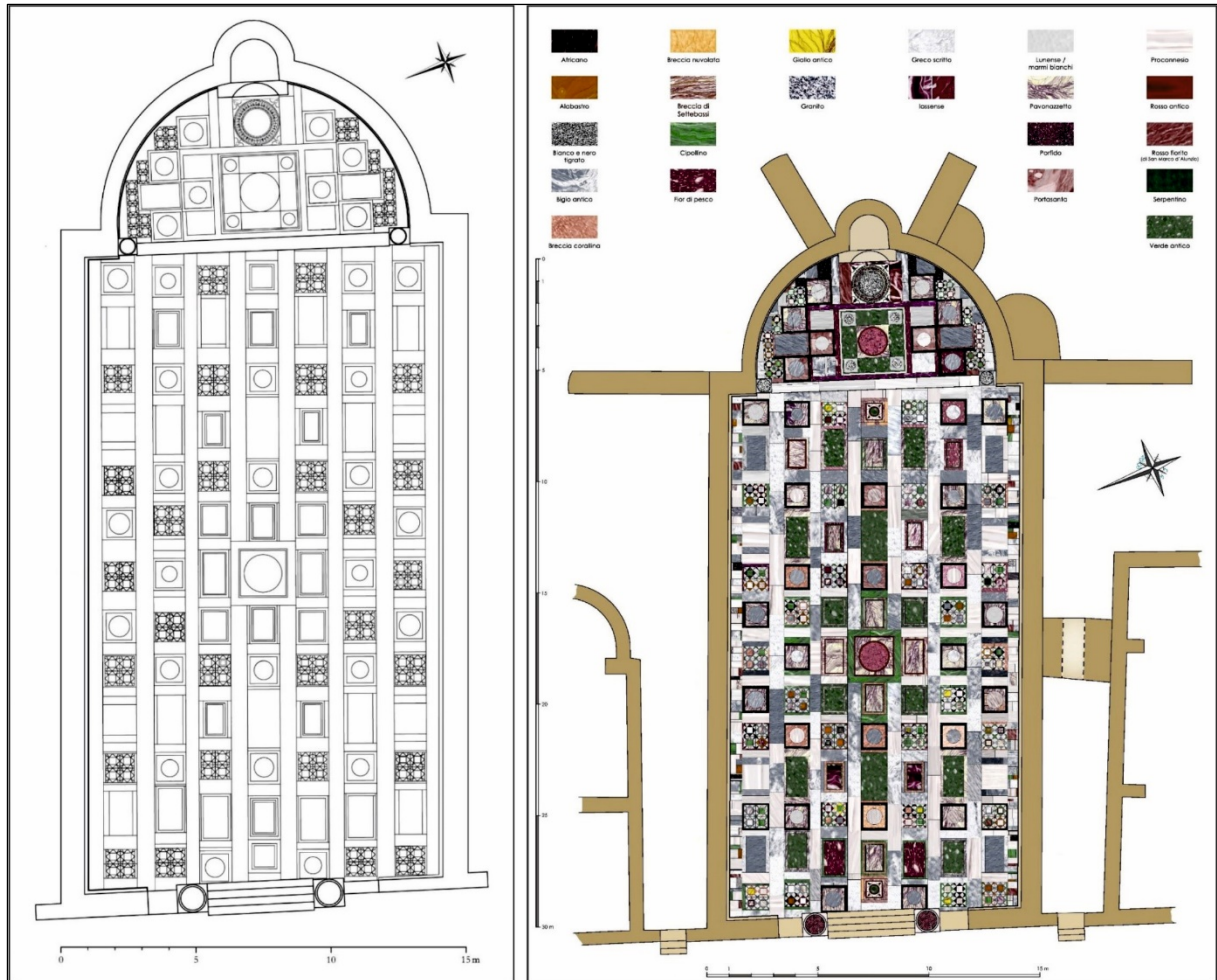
Hypothetical reconstruction of the geometrical layout of the floor's *opus sectile* (Drawing: E. Gallocchio).
